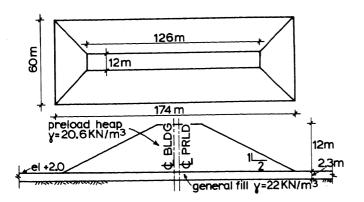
Plan and Section of Preload Heap DECISION TO PRELOAD
